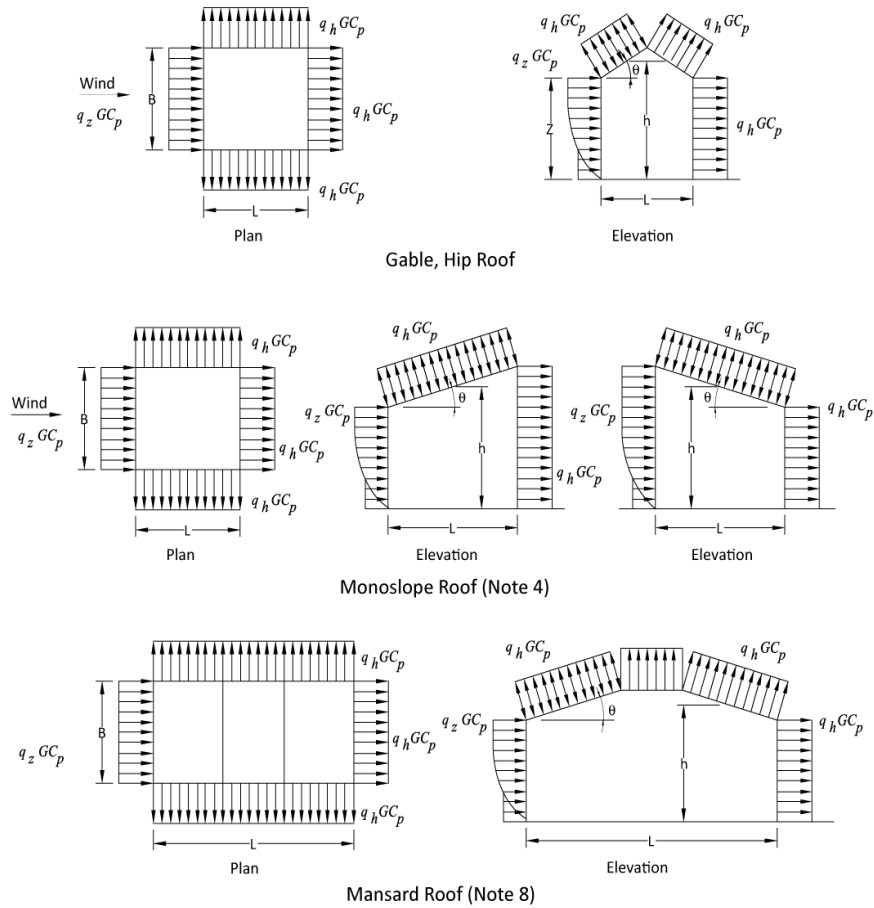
Enclosed, Partially Enclosed Buildings; Walls & Roofs
